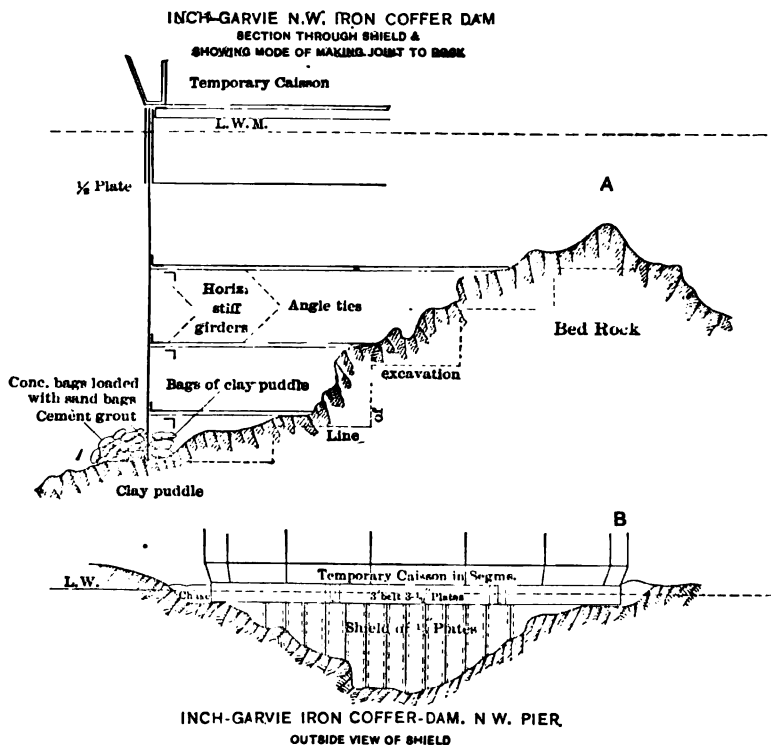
FORTH BRIDGE. METAL COFFER-DAM.
